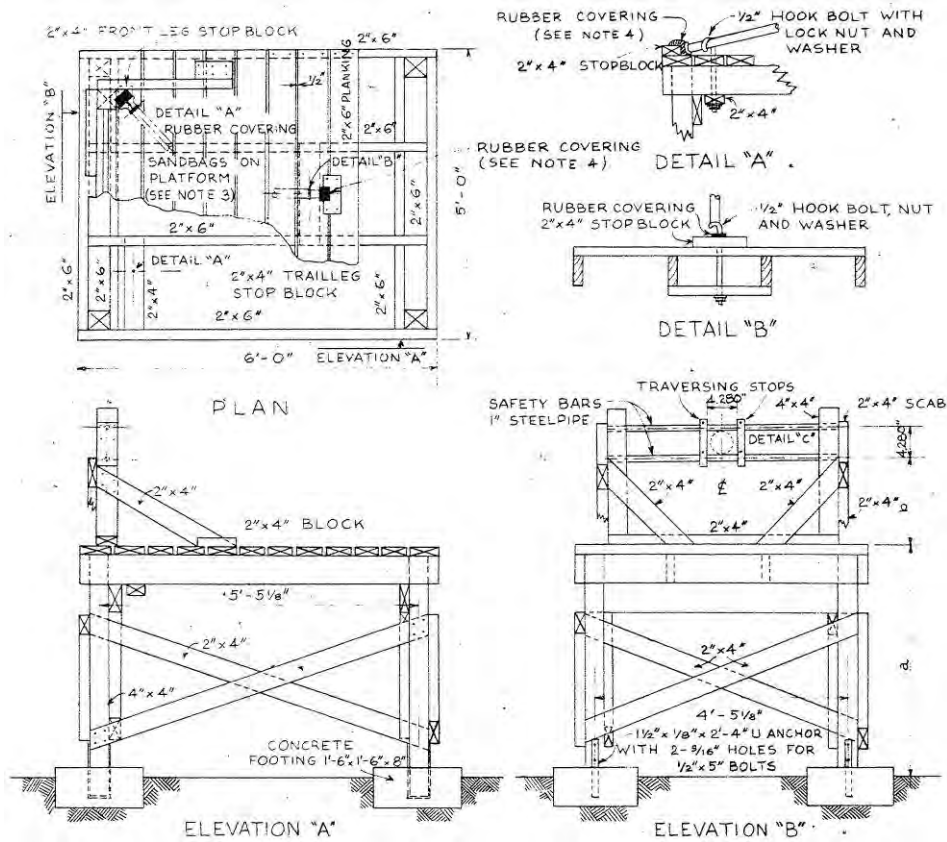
Attack course, machine gun platform, Fort Bragg, NC, 1952 (standard drawing 28-13-99 sheet 2 of 2; attack course, details; 20 June 1952).
